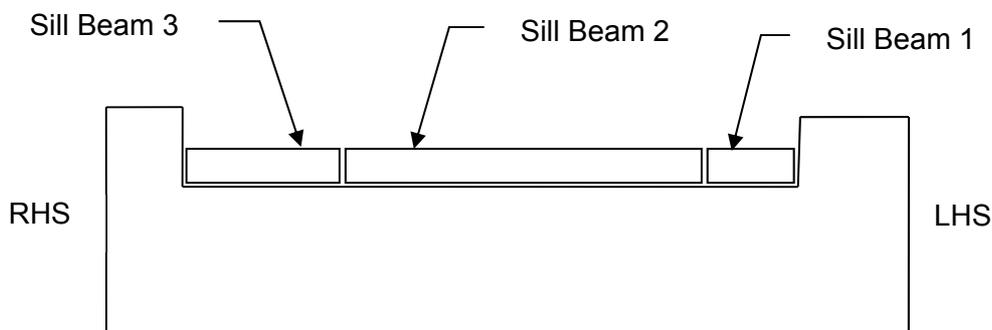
SILL BEAM SECTION NUMBERS (ABUTMENT 1)
